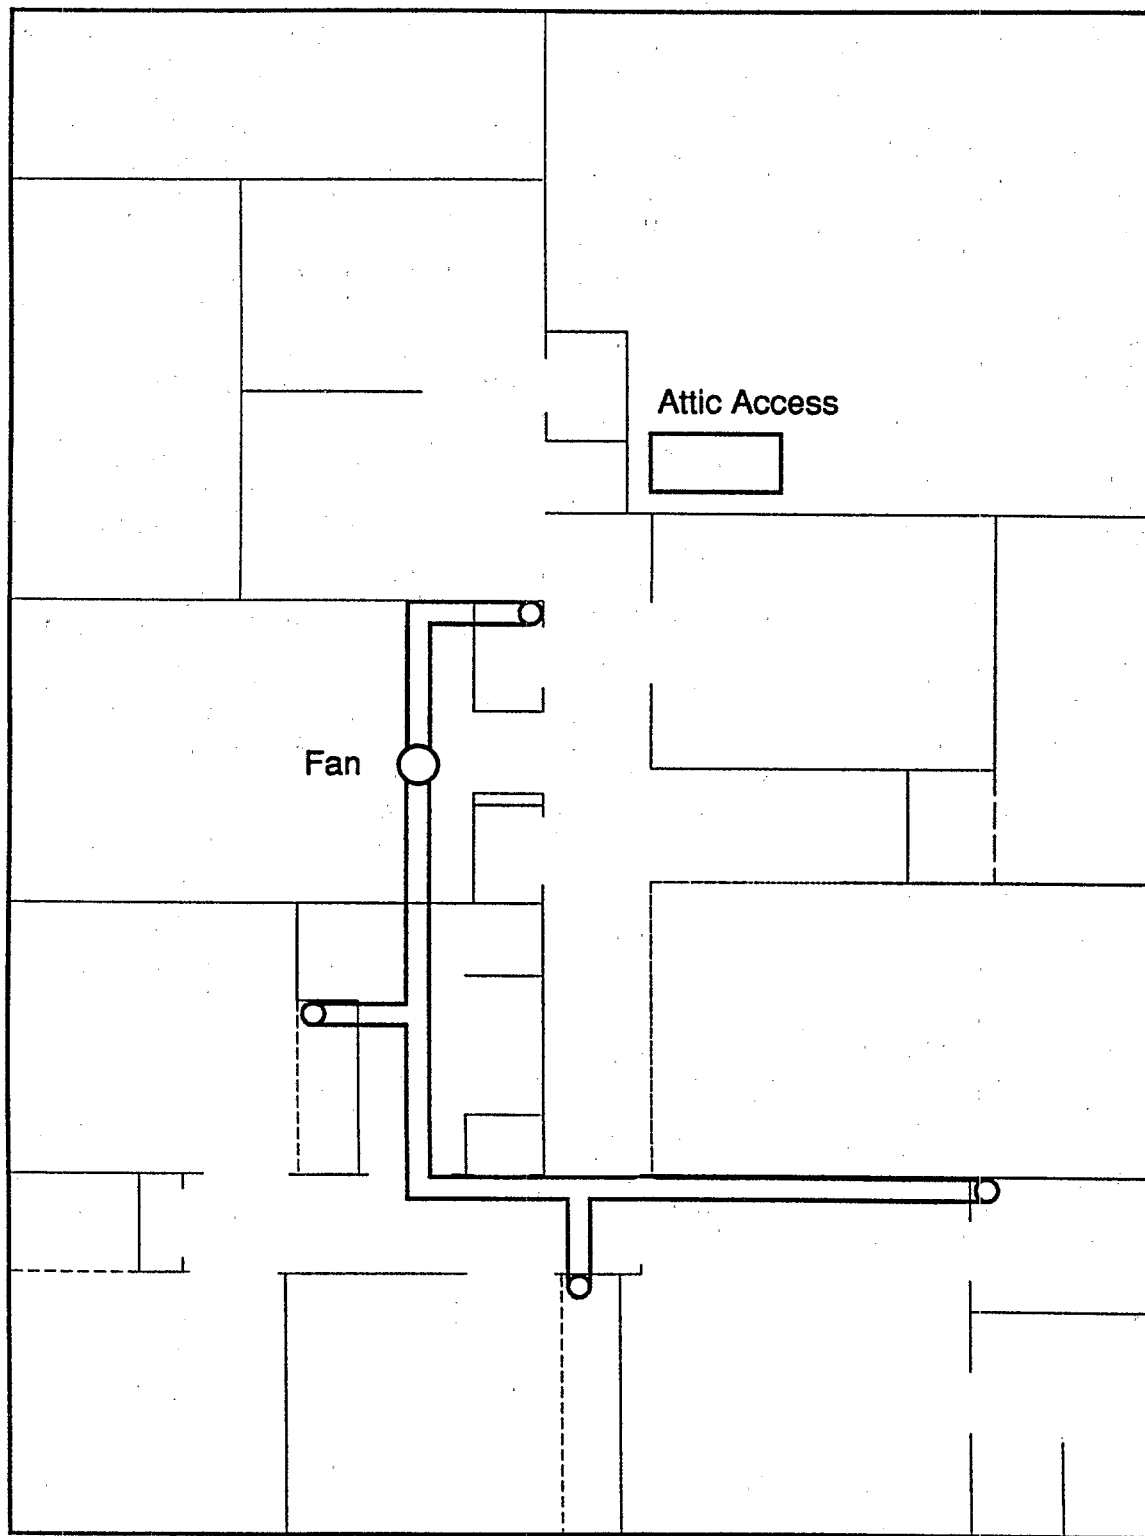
Attic piping layout for the sample house plan of Figure 1.
